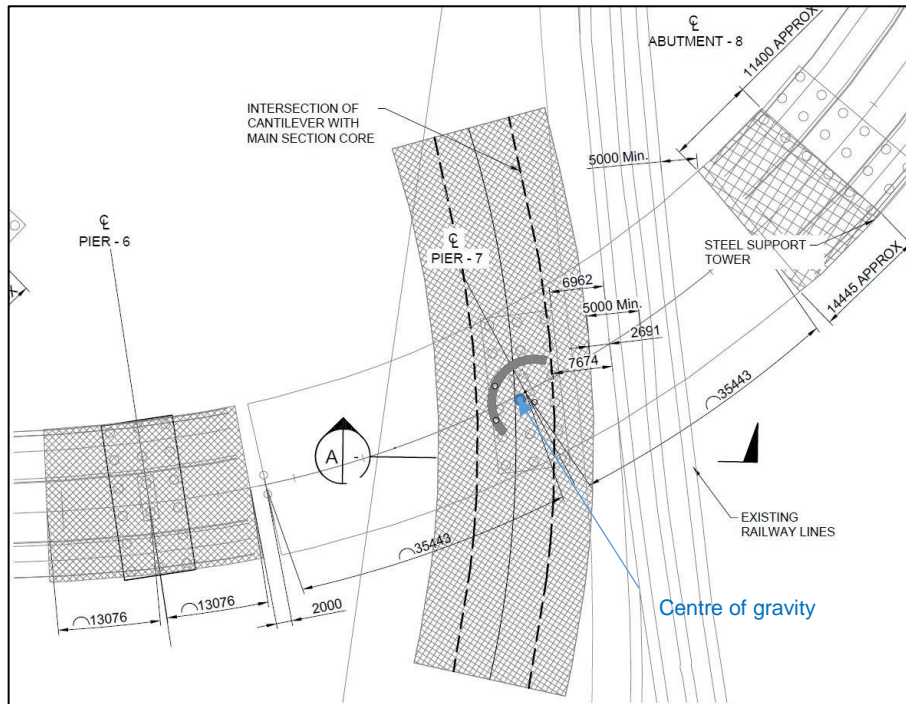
Plan view of construction stage 1 construction of superstructure using balance cantilever method (Refer to Drawing 018 for Horizontal and Vertical Clearance with Formwork)
